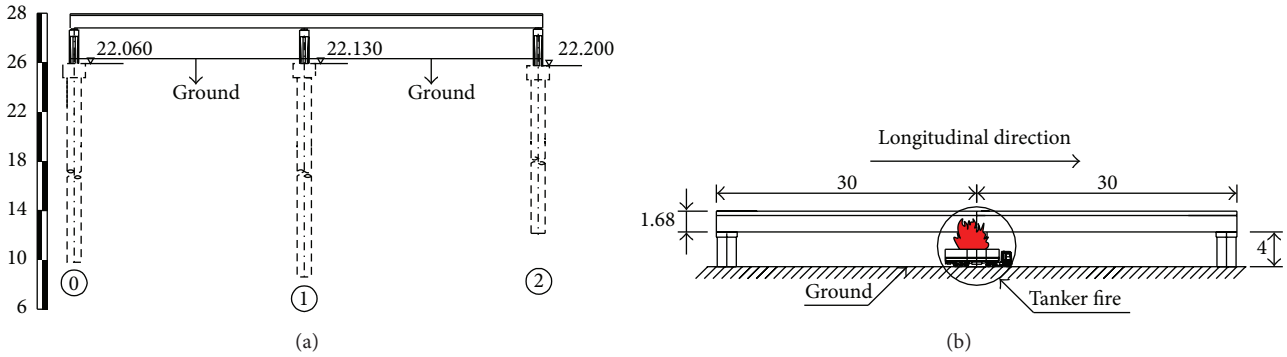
(a) Overpass of Tianhe District Second Highway Engineering in Wuhan city (m). (b) Position in which tanker fire happened (m).
